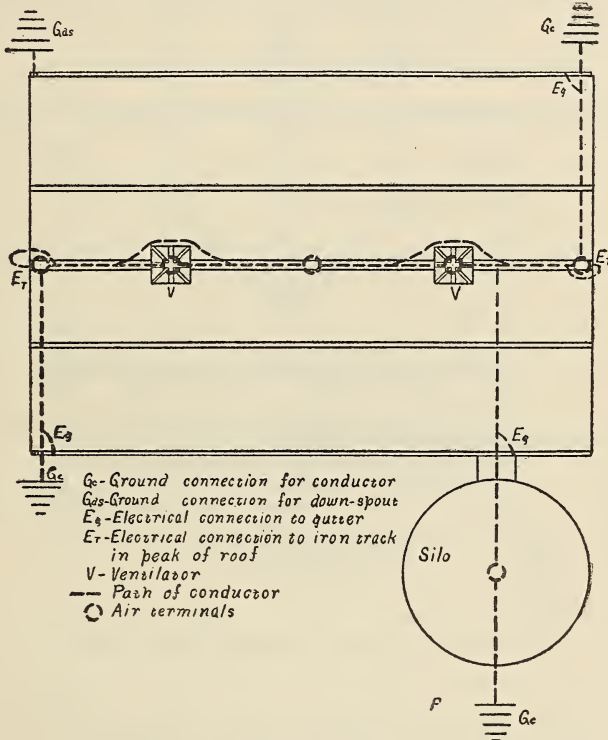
Roof plan of a rectangular barn with shingle roof, showing course of lightning rods and location of air terminals
